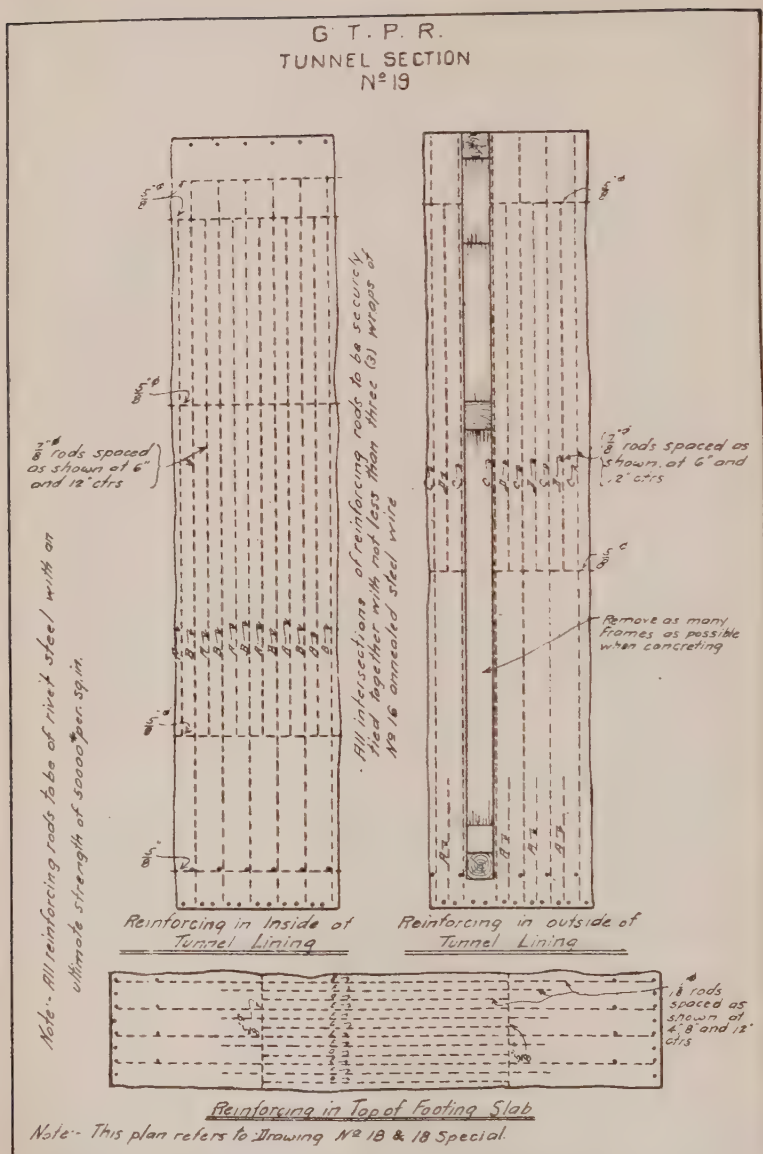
Reinforcing Details for Concrete Tunnel Lining, G. T. P. Ry.
